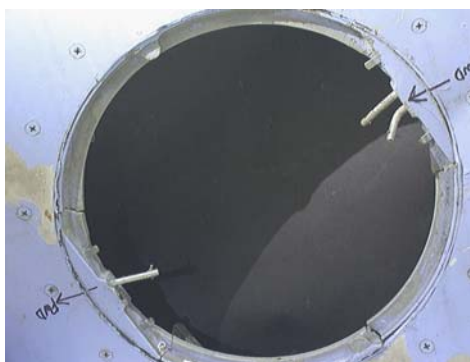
Interior view of opening with valve removed (looking inside to outside).
